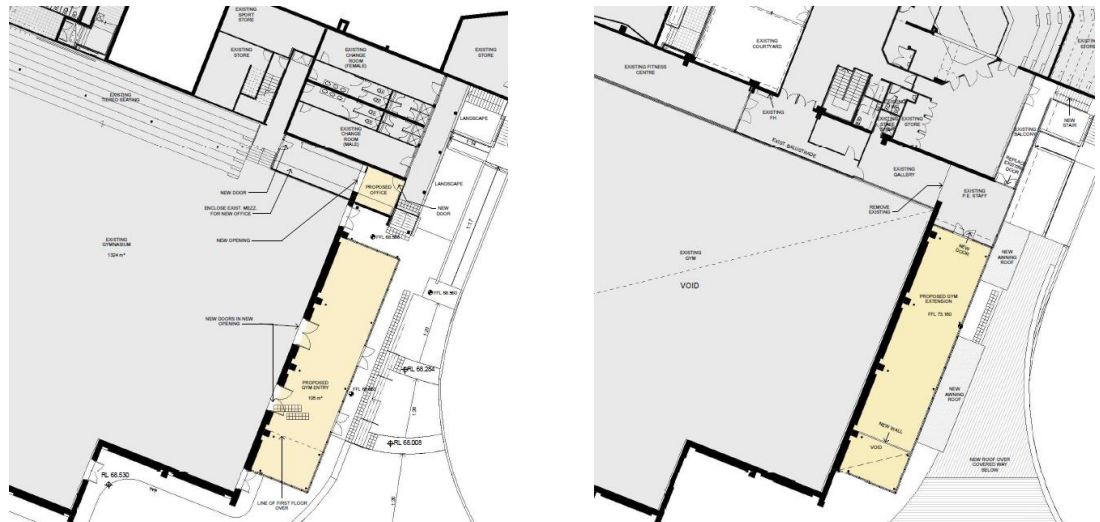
Ground (left) and First Floor (right) Alterations and Additions to Gymnasium
